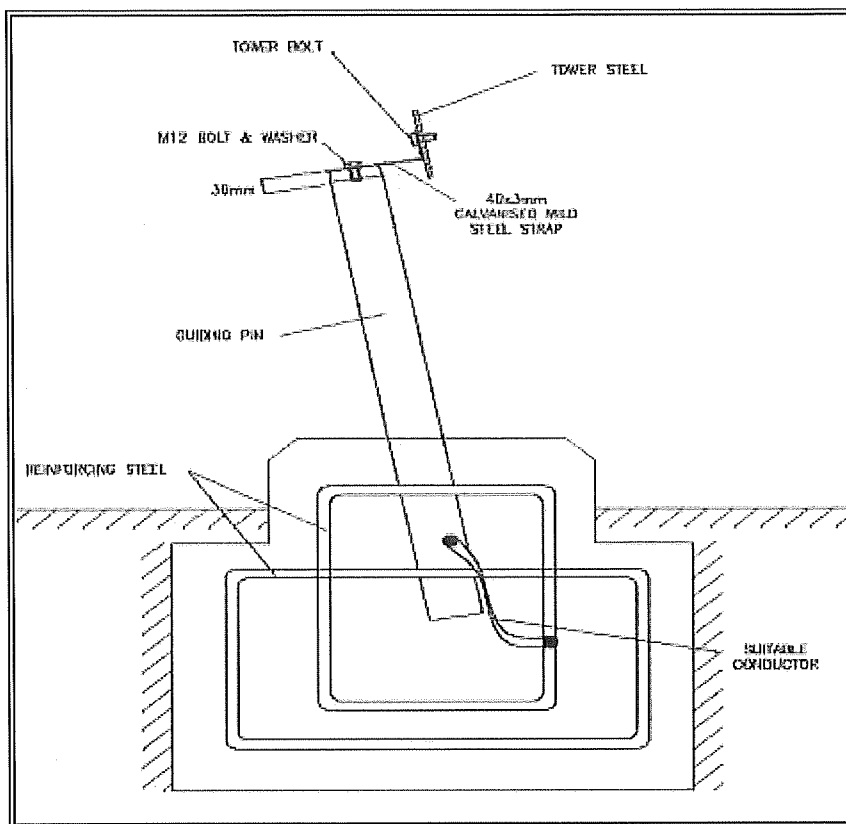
Tower Leg, Locating Pin and Foundation Rebar Connection
